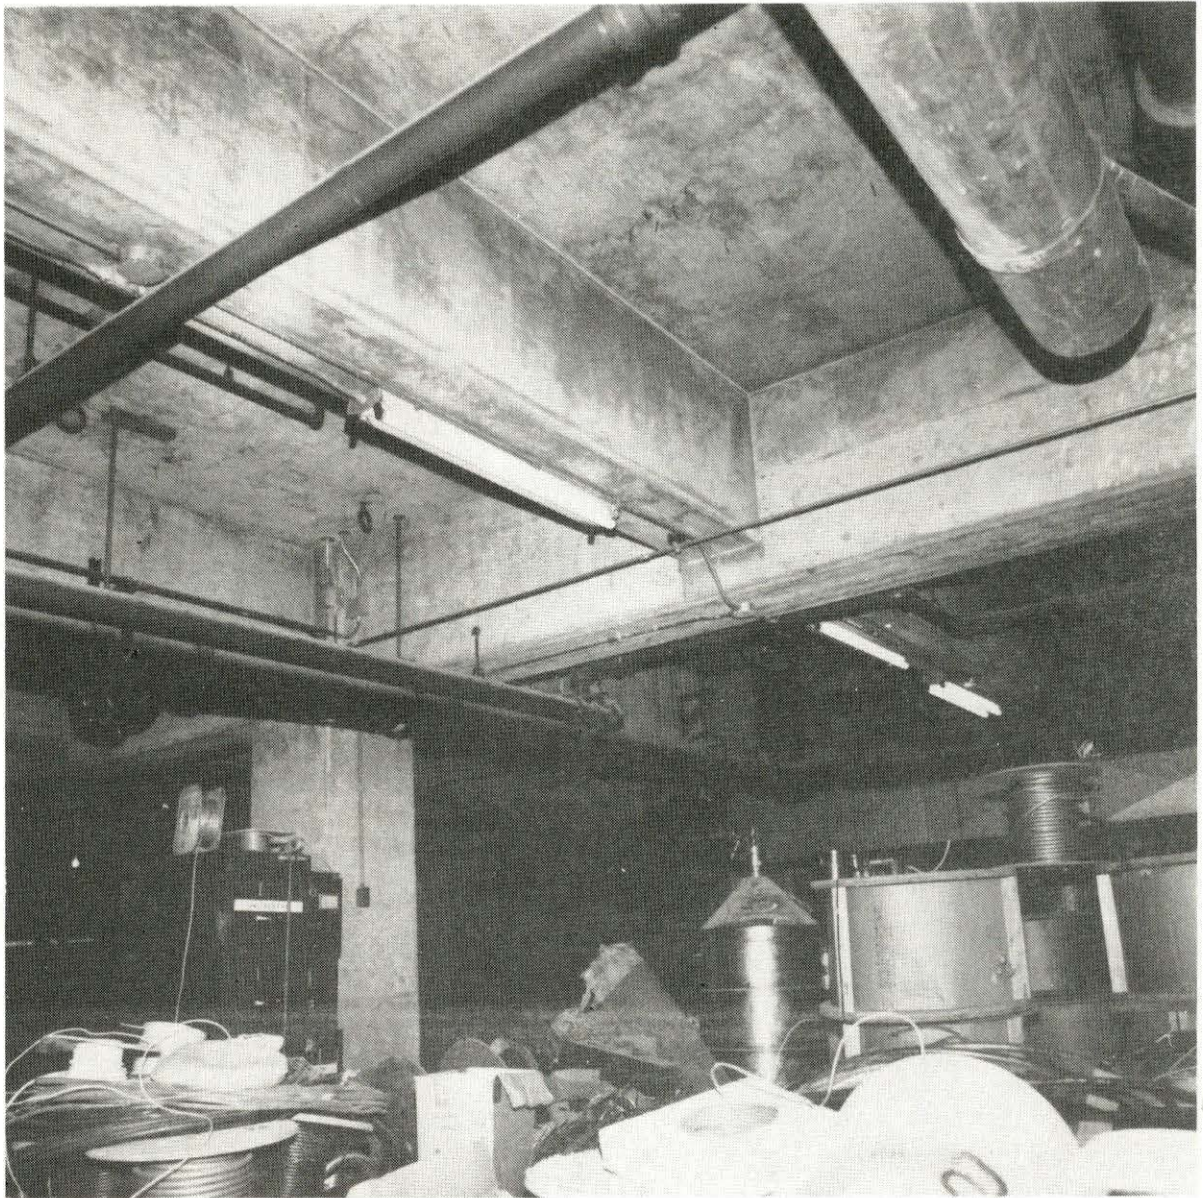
East end basement of Building 9204-1, looking northeast into Section I.
